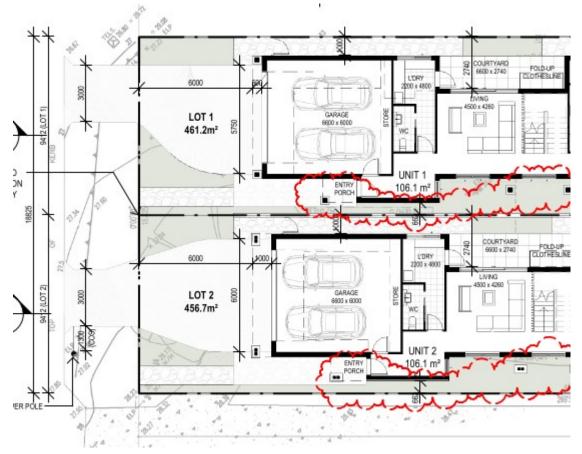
Detailed ground floor plan of dual occupancy at 19 Russell Street, Balgownie
